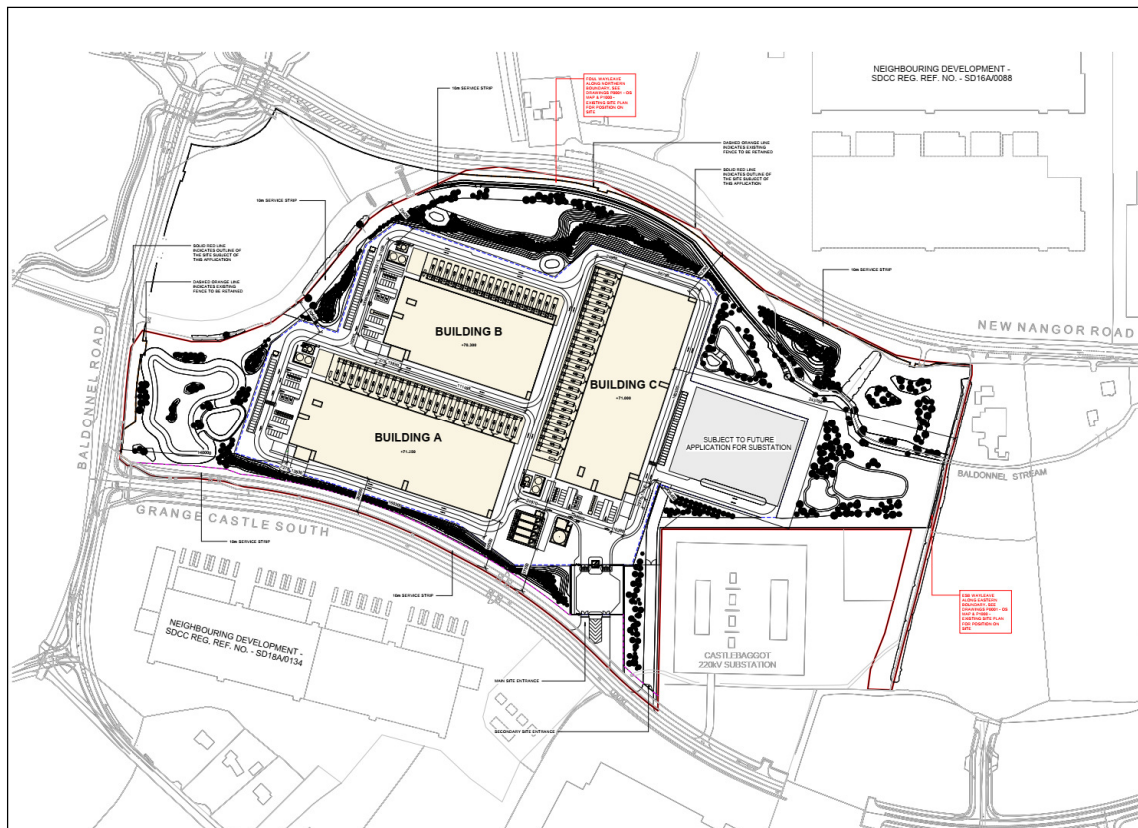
Permitted Development site layout plan (application boundary outlined in red) as granted under SDCC Planning Ref. SD20A/0121 indicating future substation compound site (Source: Henry J Lyons Architects April 2020)
